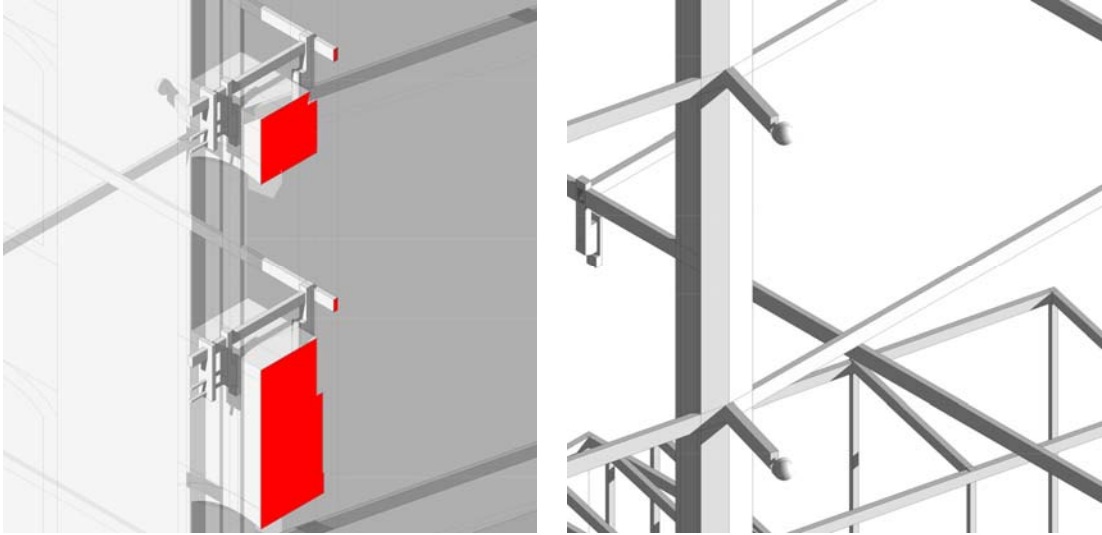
Detail of stabilizing clamps. Clamps attach through the rough opening in the walls to stabilize the structure in both directions.
